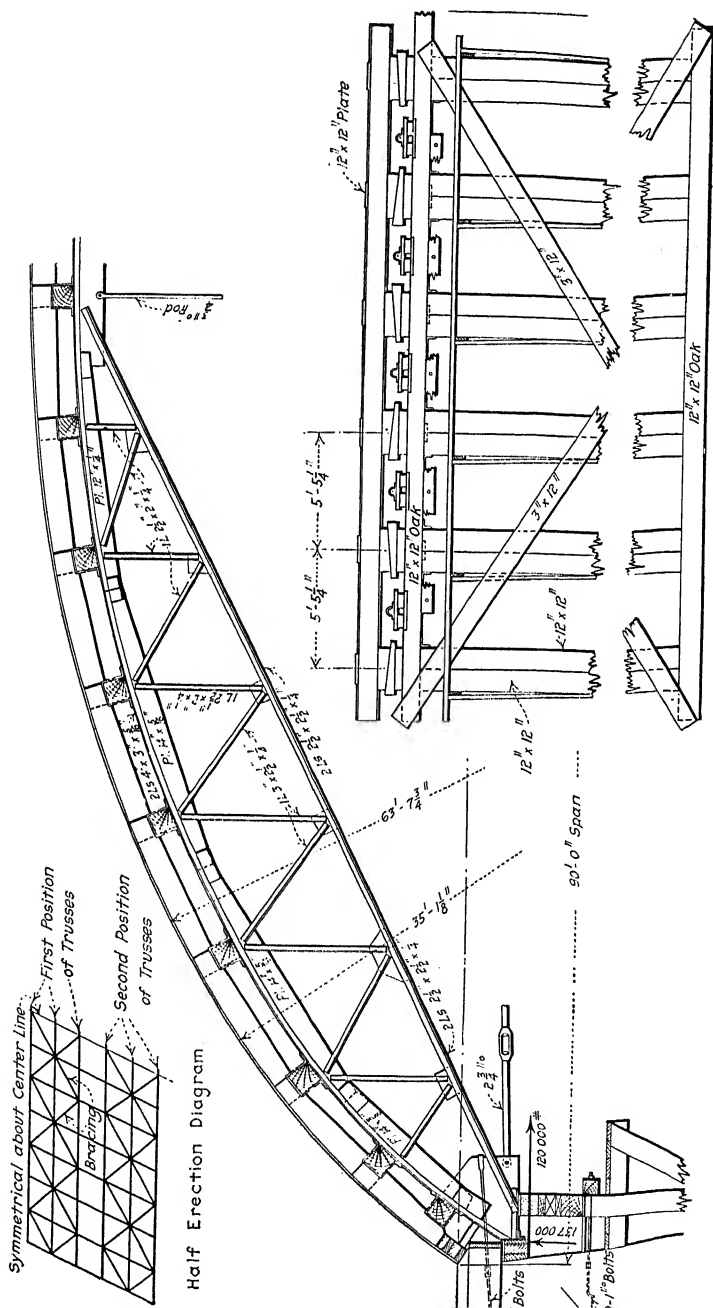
Steel centering for Atherton Avenue bridge, Pittsburgh, Pa.
